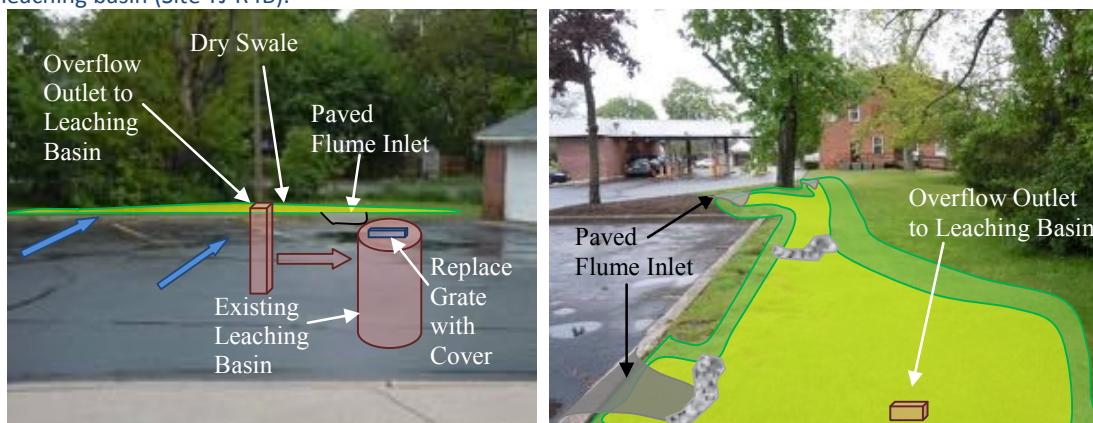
Proposed dry swale in grassed area near garage, overflow from dry swale to be piped to existing leaching basin (Site TJ-R4B).
